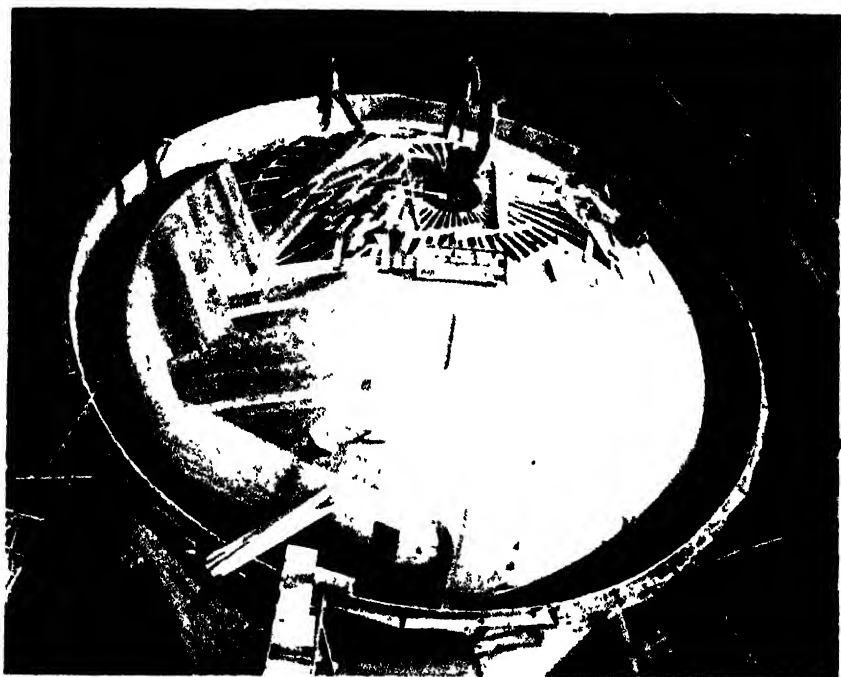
DOME FORMS FOR TOWER, NEW STANDPIPE.
